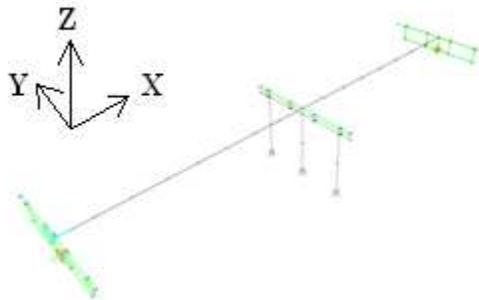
Two-span simply-supported bridge model in SAP2000.
